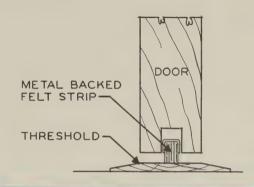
Automatic threshold closer for sealing bottom crack of door. Felt strip raises into door when door is opened.
